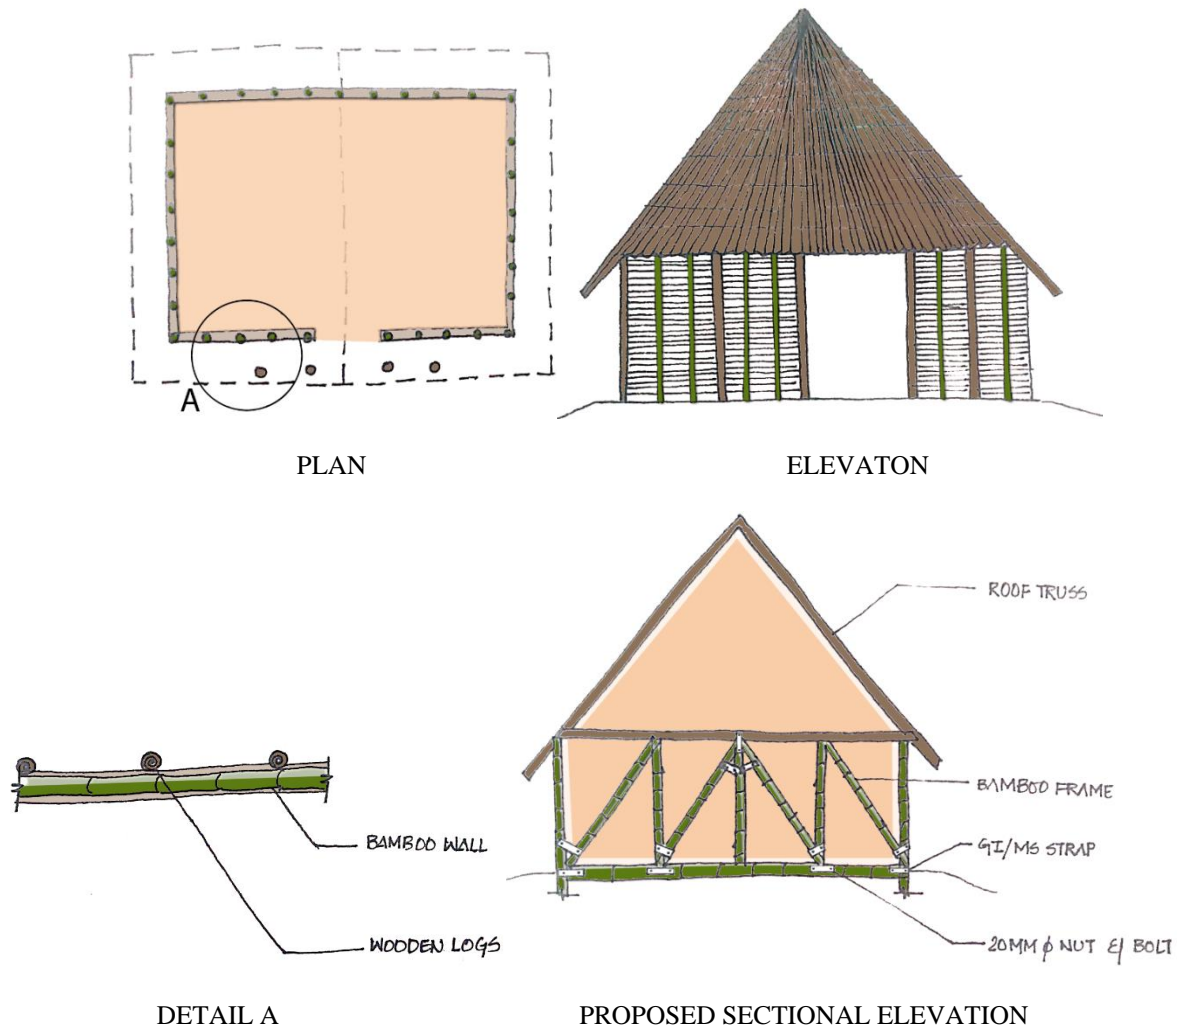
BAMBOO FRAME WALL WITH THATCHED ROOF
